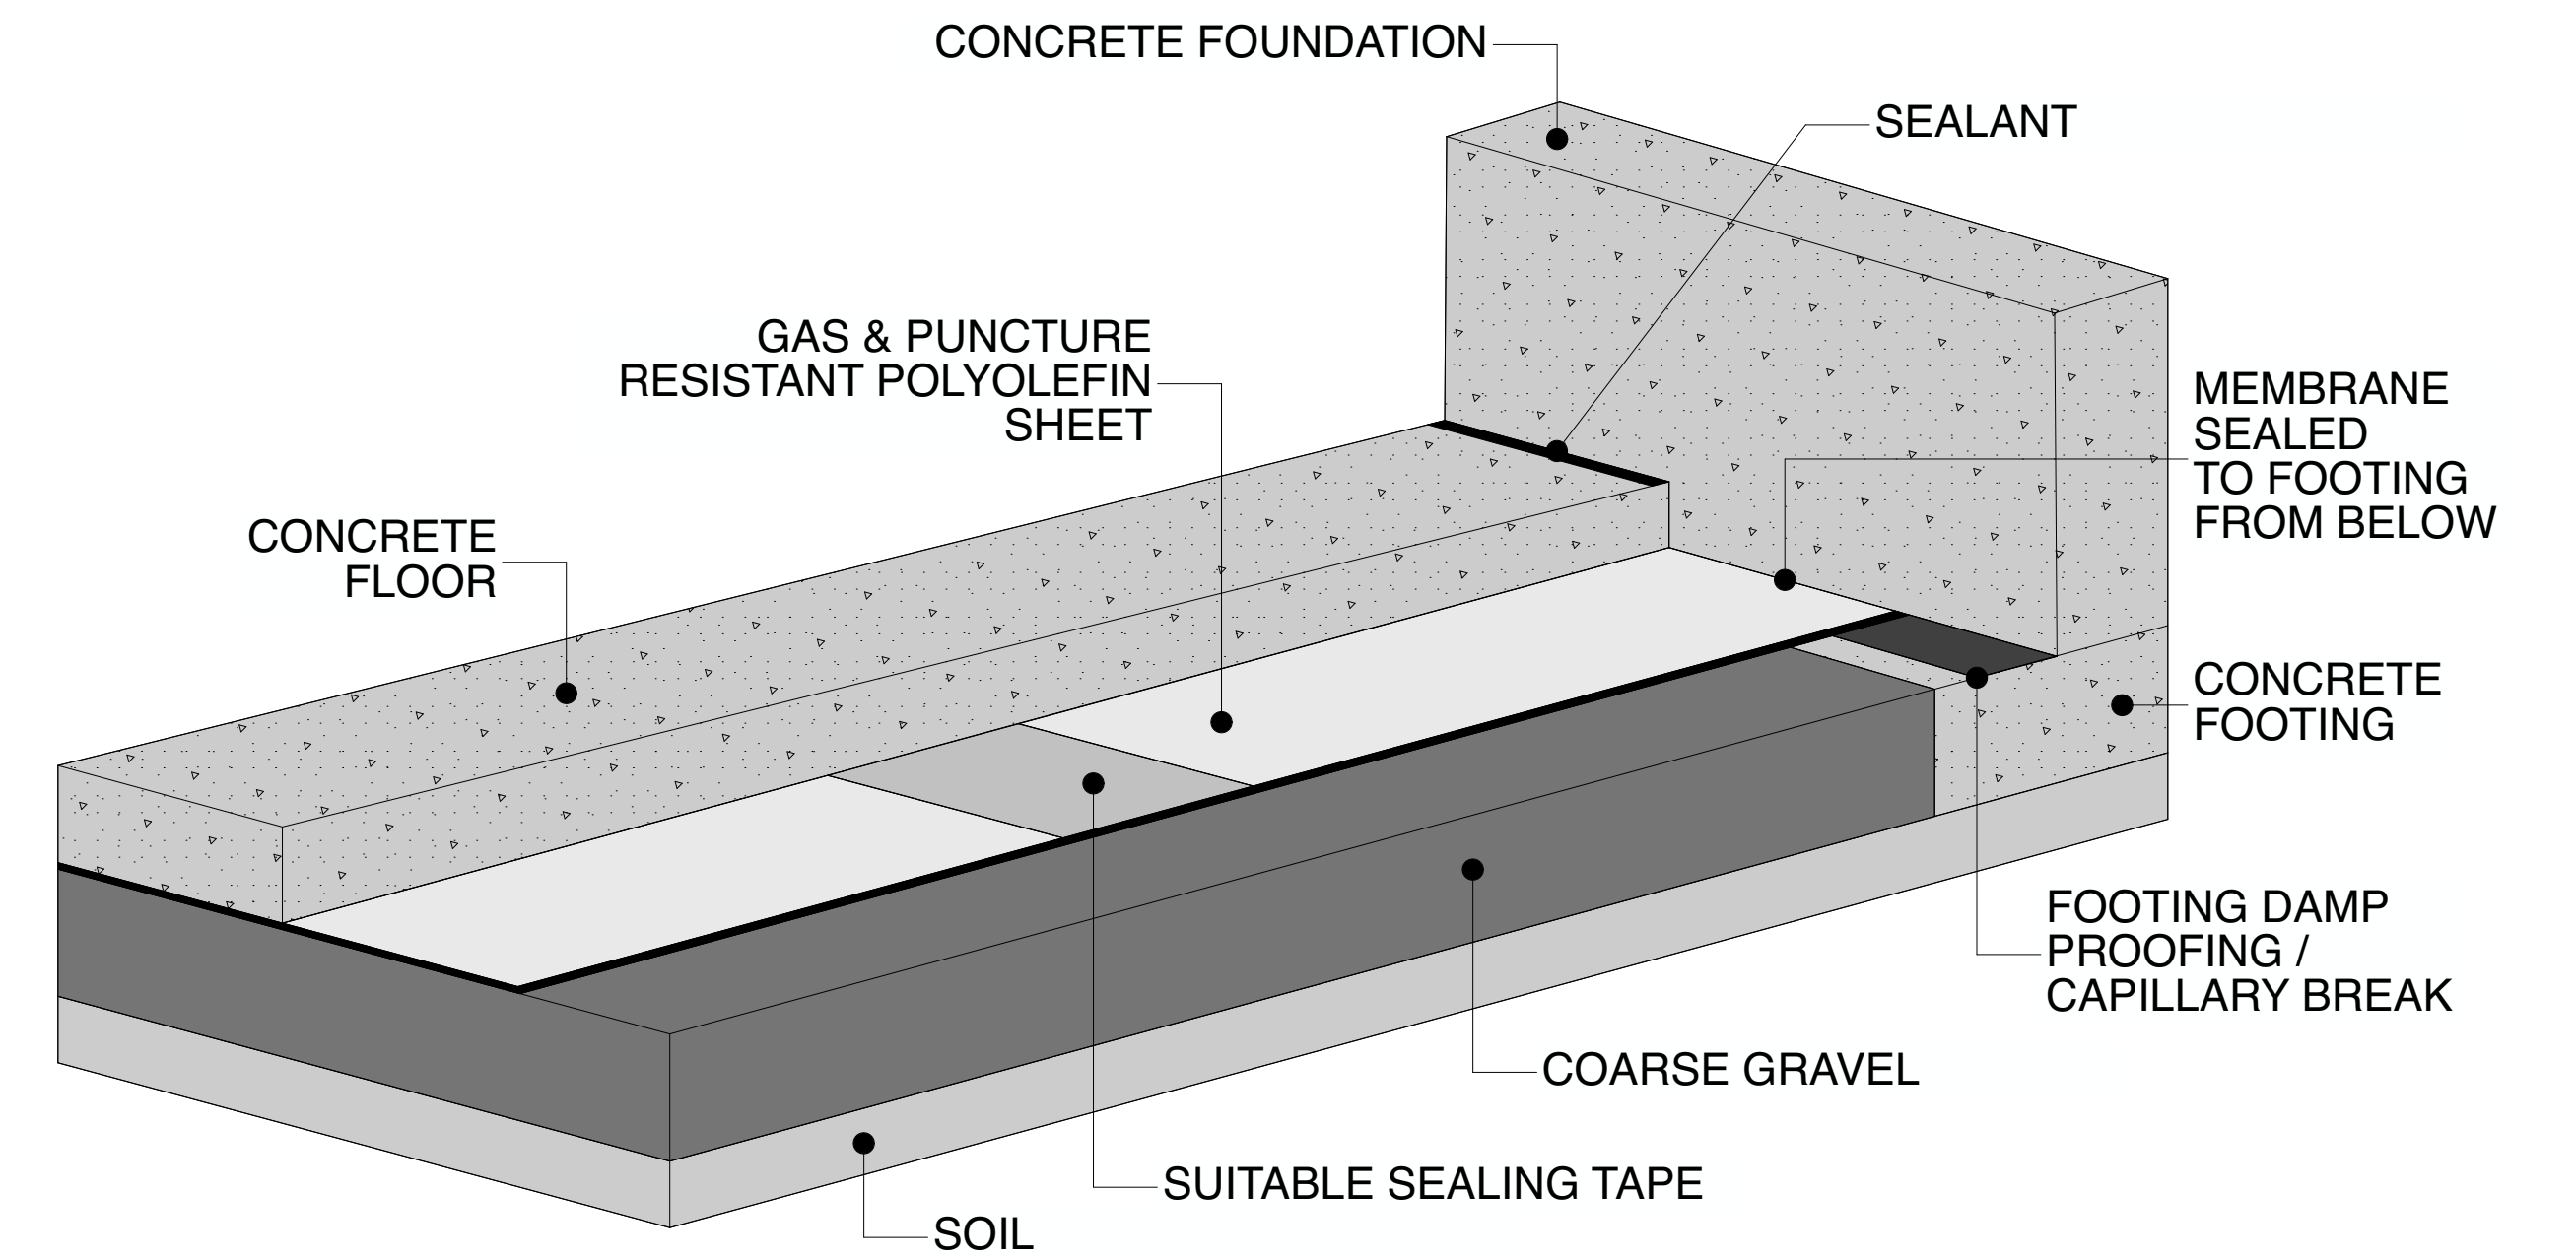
SEALING SUB-SLAB MEMBRANE HORIZONTALLY TO CONCRETE FOOTING PRIOR TO SLAB POUR AND OF THE SLAB/WALL EXPANSION JOINT AFTER THE SLAB POUR
